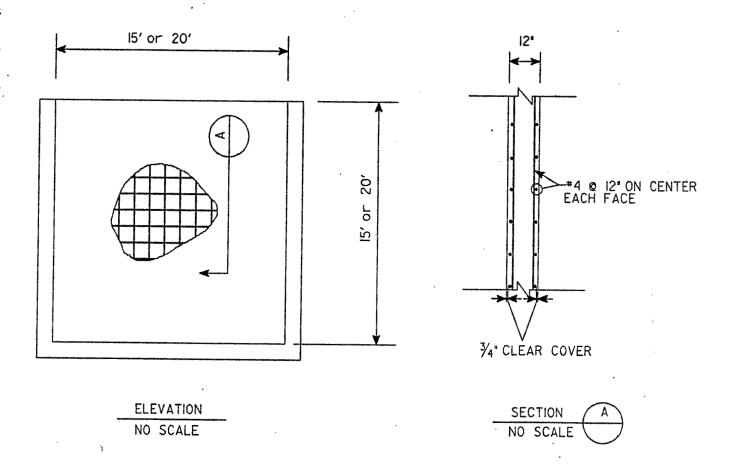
Typical 12" Reinforced Concrete Dividing Wall
